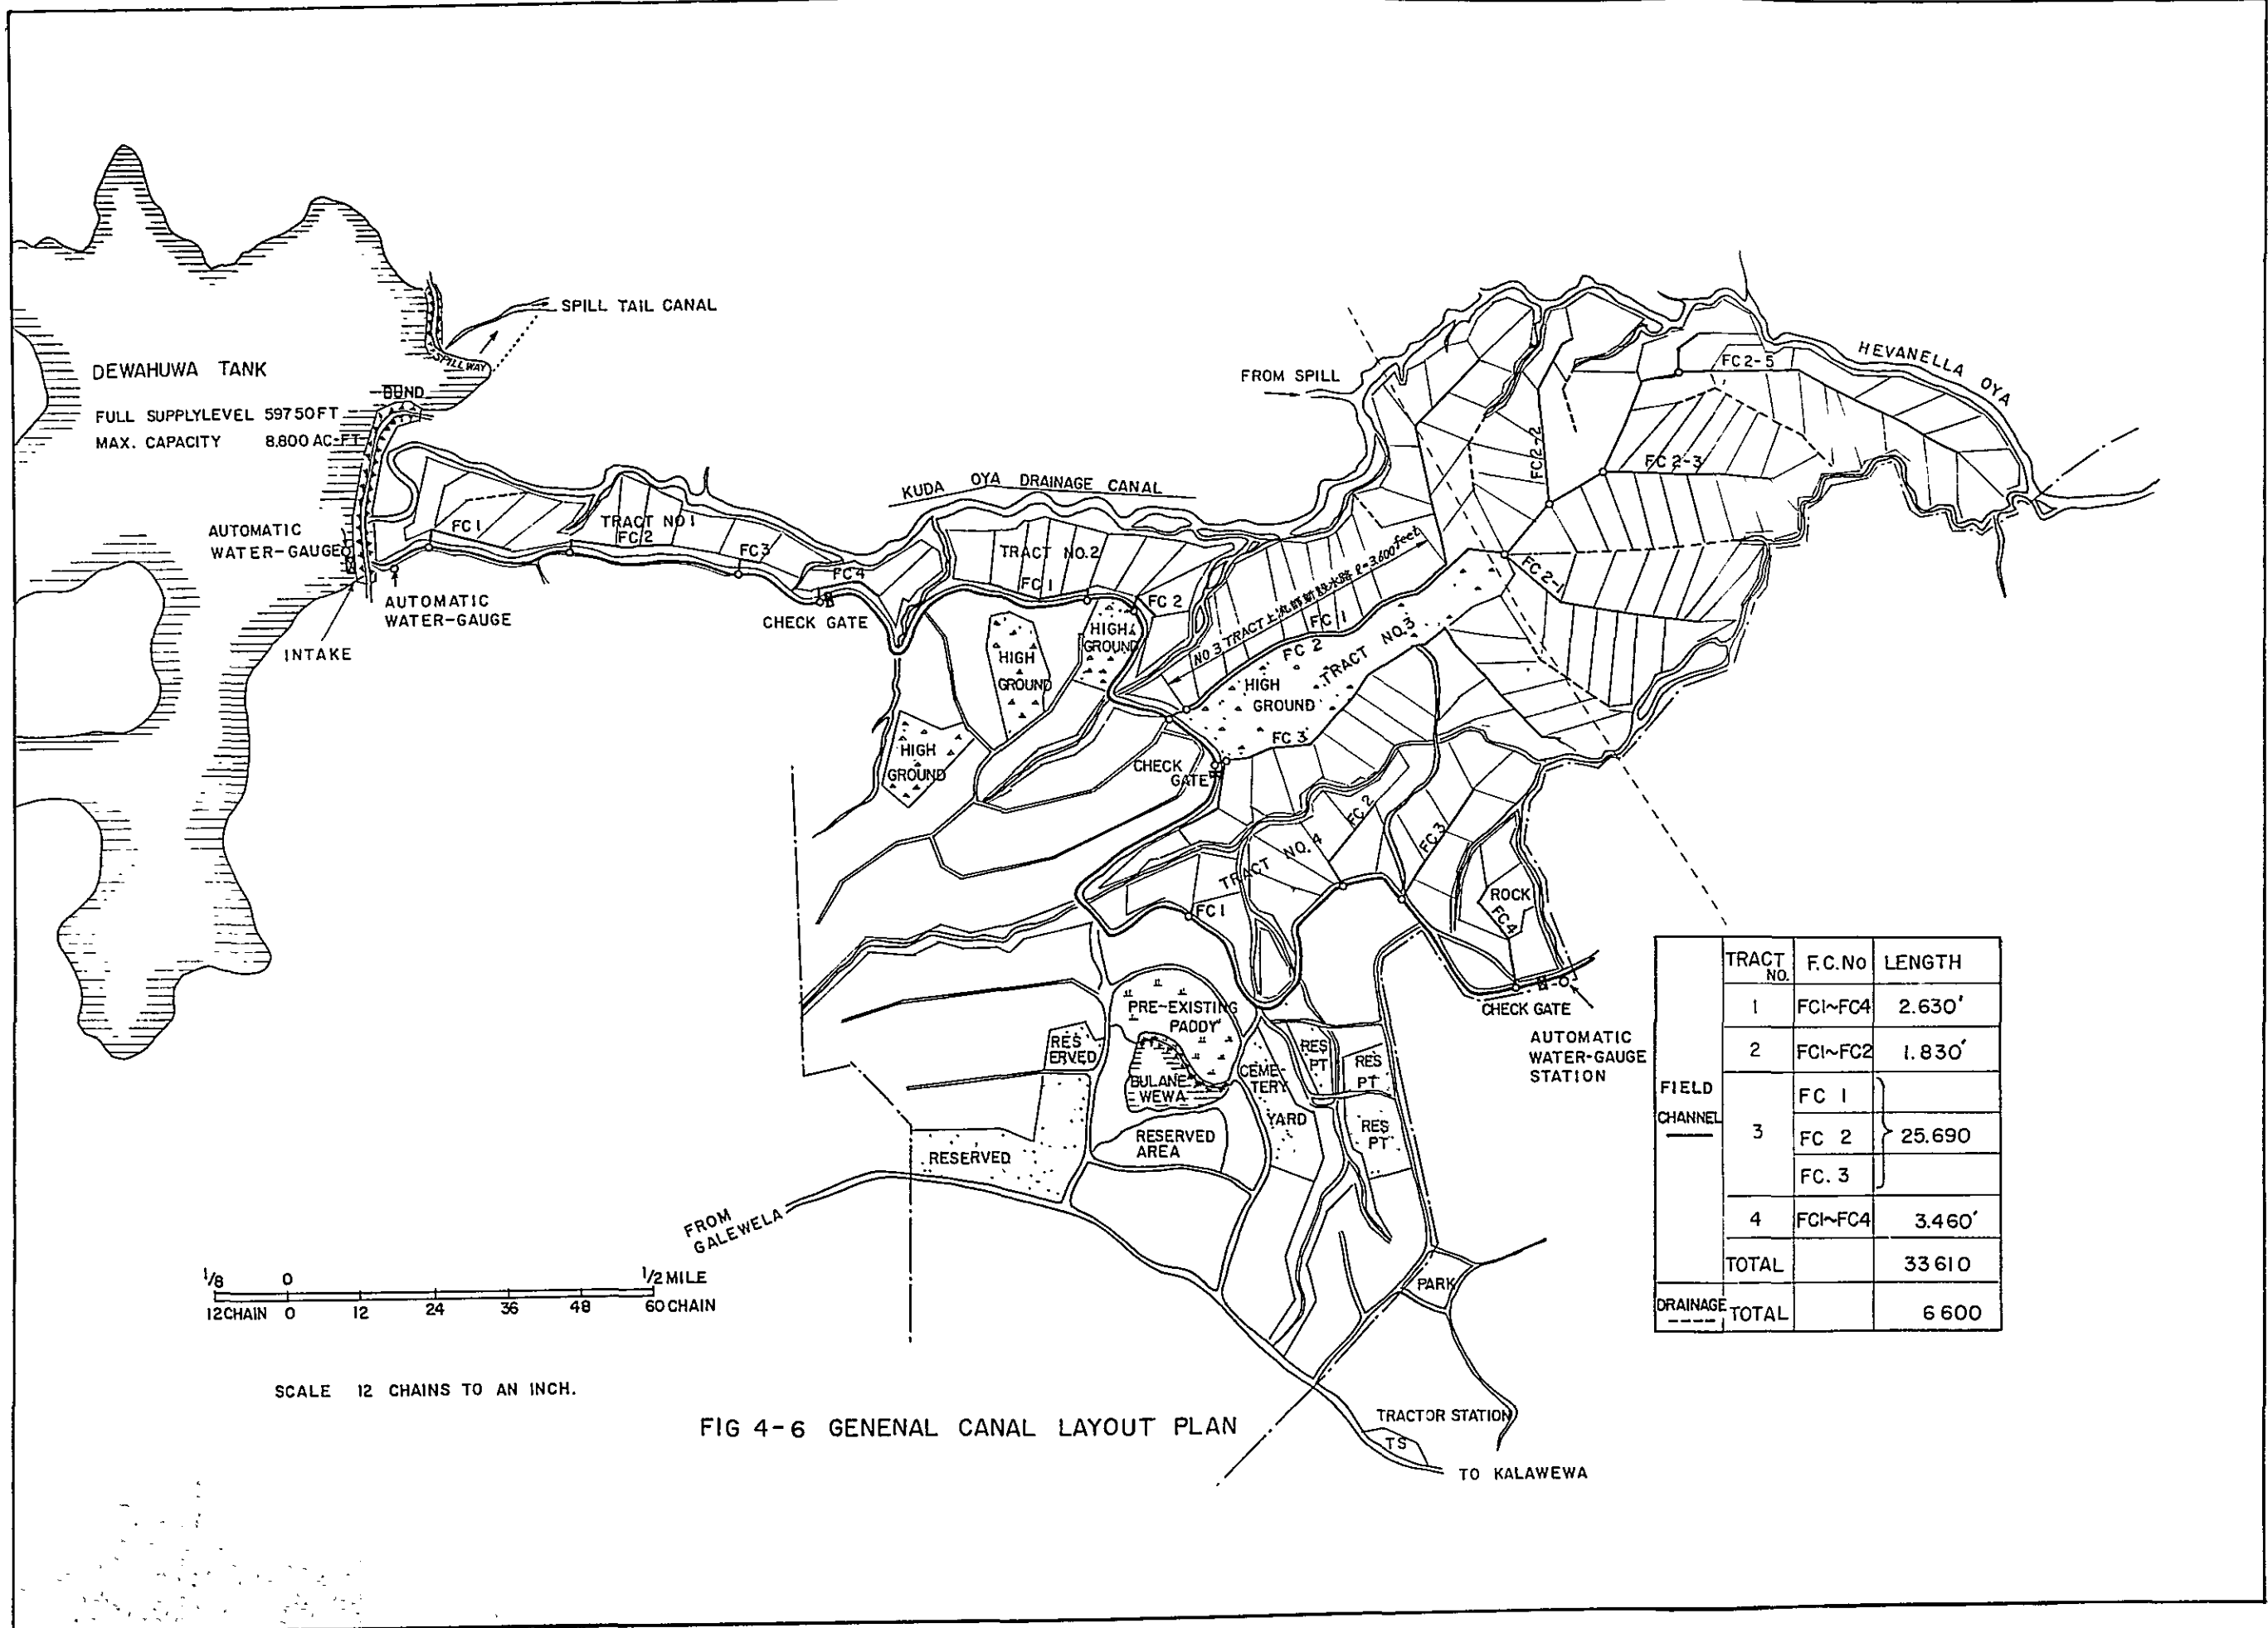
GENENAL CANAL LAYOUT PLAN
